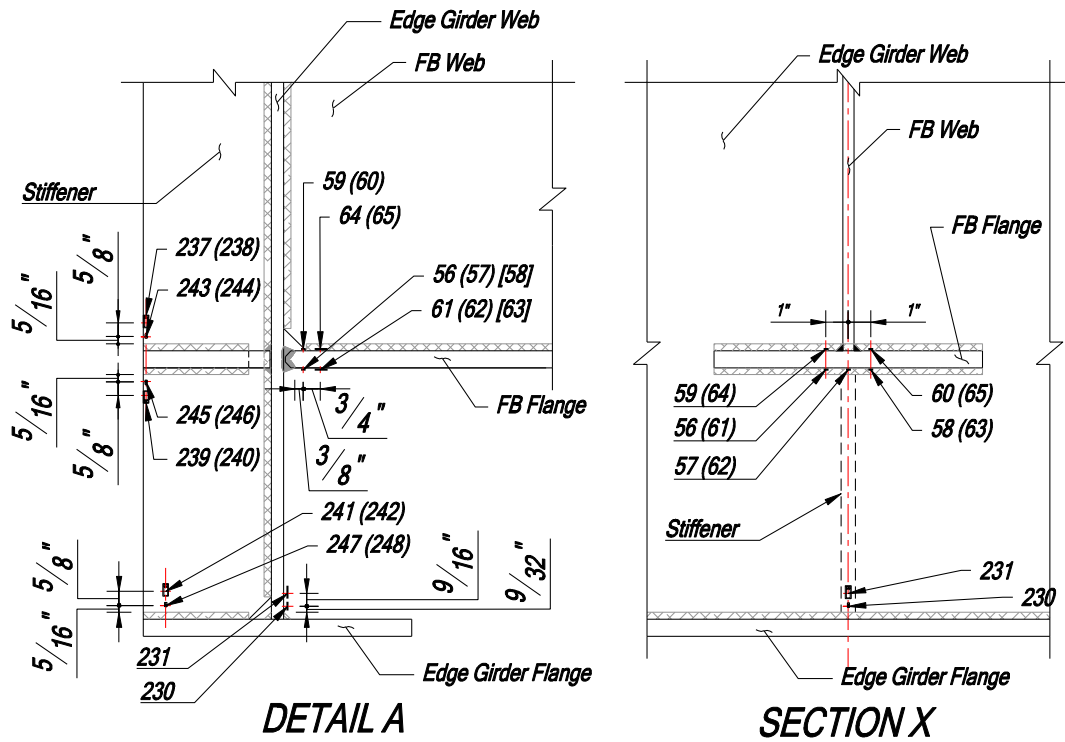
Gauges on east face of inner FB web at Rib 1 (gauges on the west face are shown in parenthesis)
